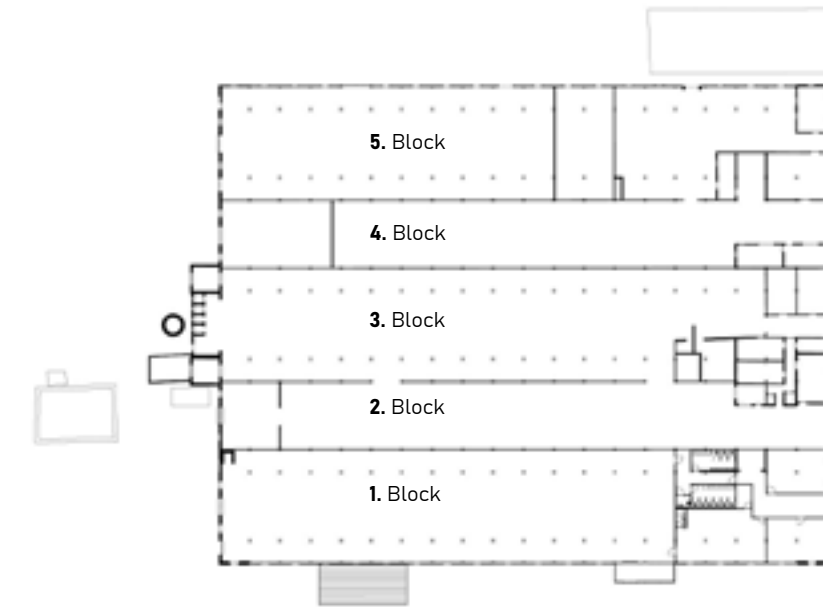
Created by autor (2025). Exiting Ground Floor Plan 1/1000
